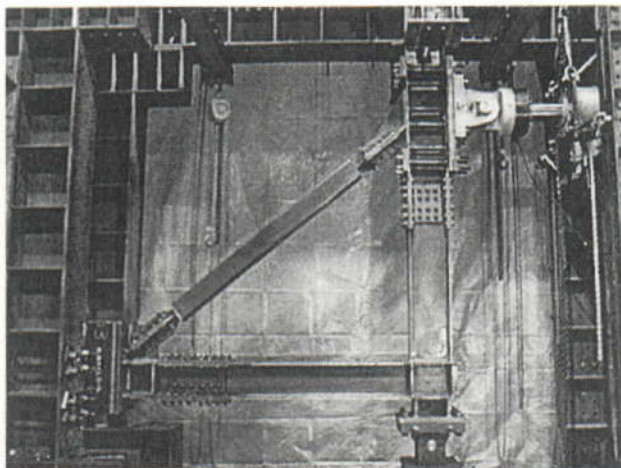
Specimen of frame with hysteretic damper (MRF2+brace)
